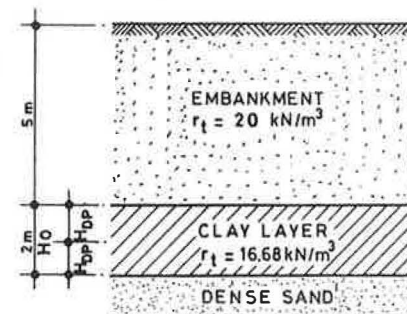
Example soil profile showing treated clay layer and embankment fill.
